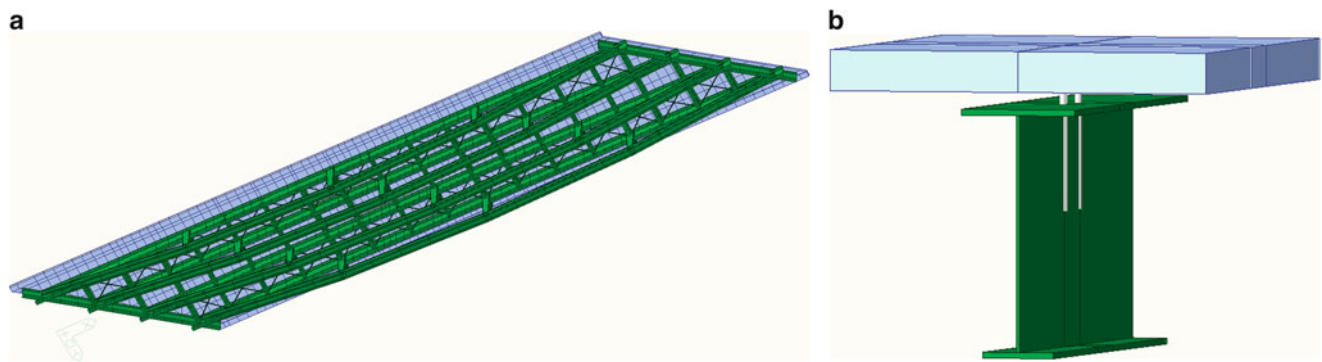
FE model of Muzza bridge, (a) final model, (b) detail of the beam-slab connection
